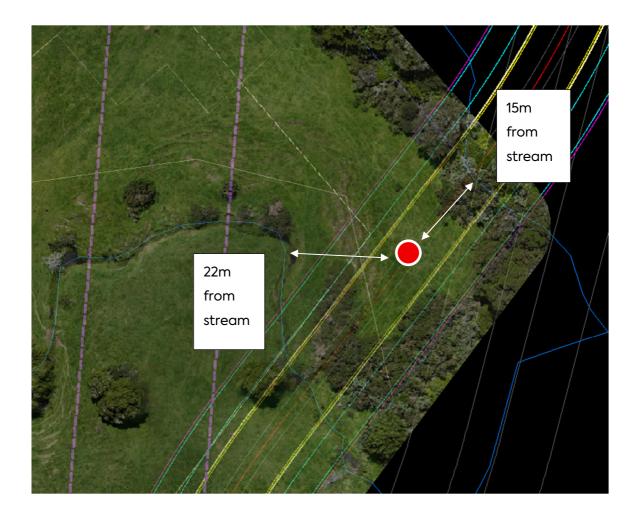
Indicative location of mid-span pier. Refer Long-section for bridge configuration.
